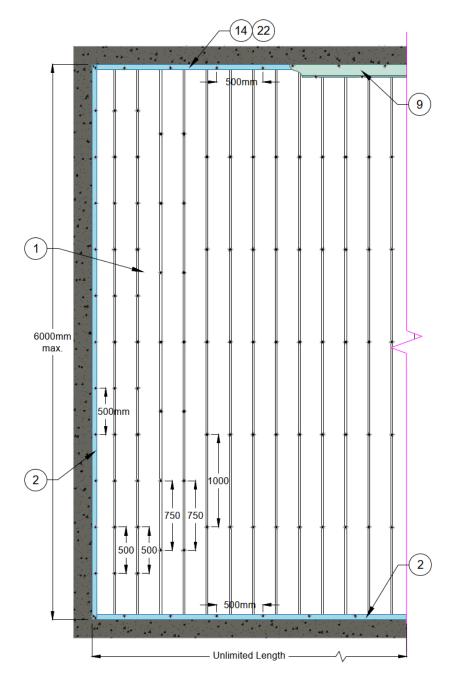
Elevation of vertical Speedpanel wall (up to 6 m high, only for 78 mm wall system)
